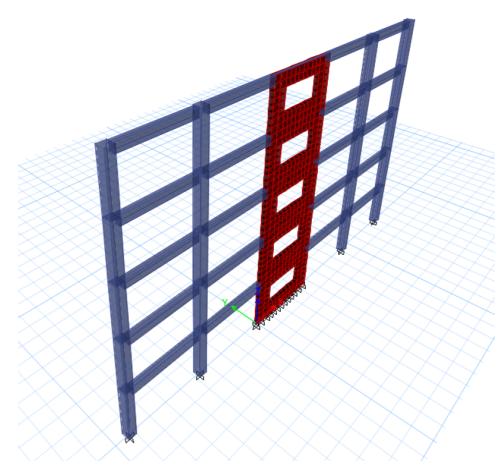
Mid-rise Shear Wall–Frame Systems (Dual system) with opening
